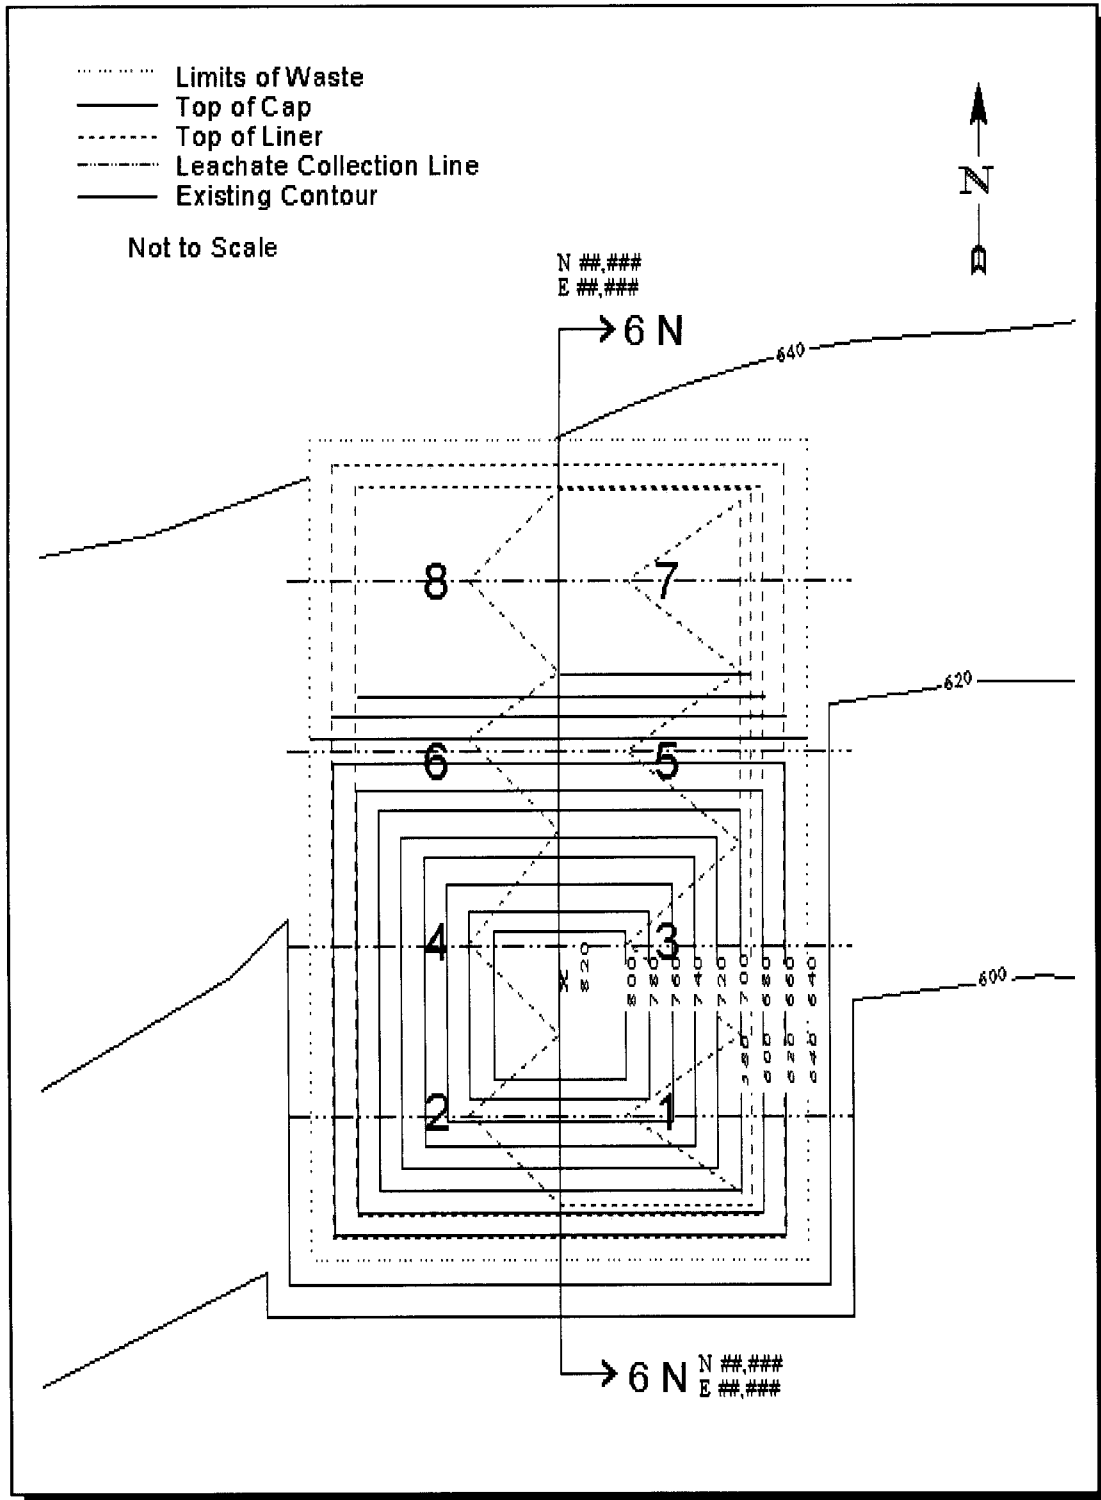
Example plan view showing the location of one of the *interim slope* cross sections that were analyzed for stability.
